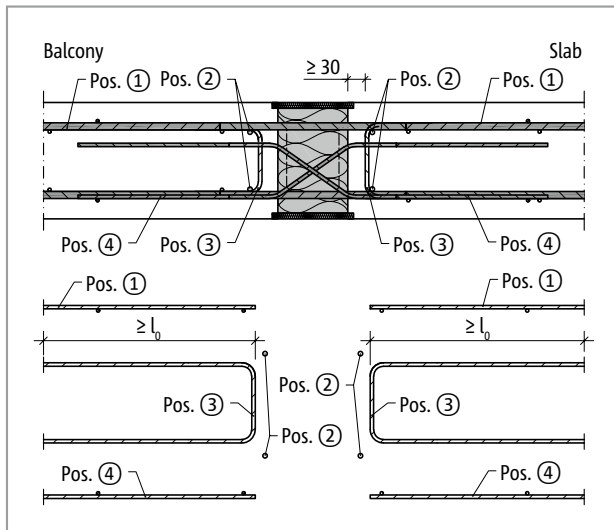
Schöck Isokorb® XT type D: On-site reinforcement
